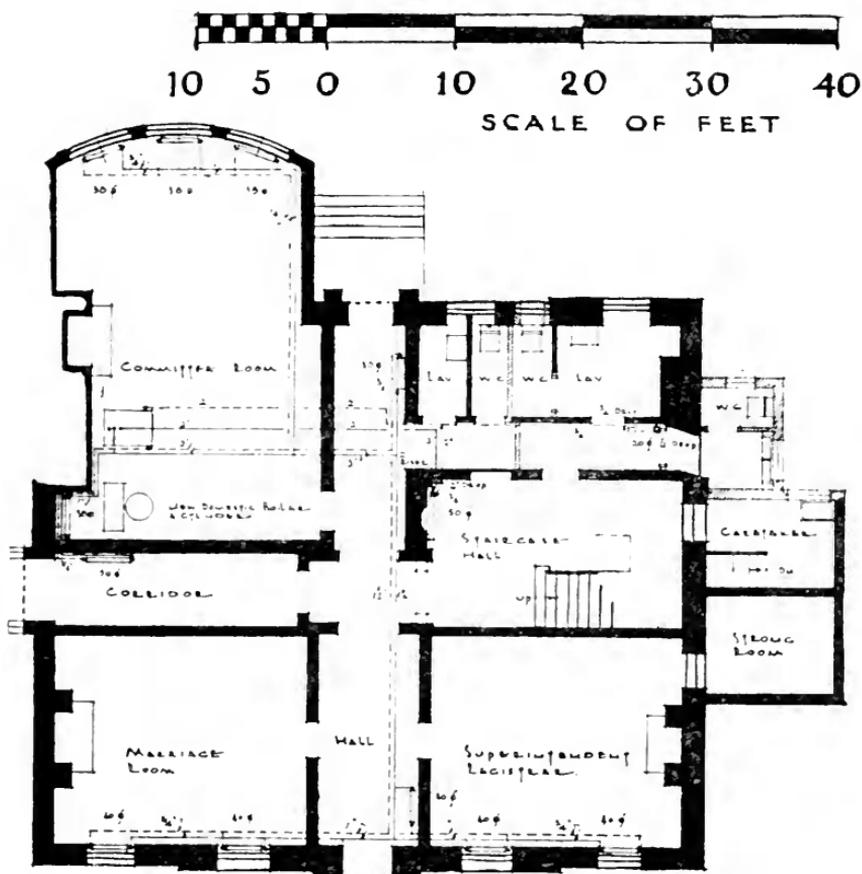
ASHLEY HOUSE, EPSOM: GROUND FLOOR PLAN.
